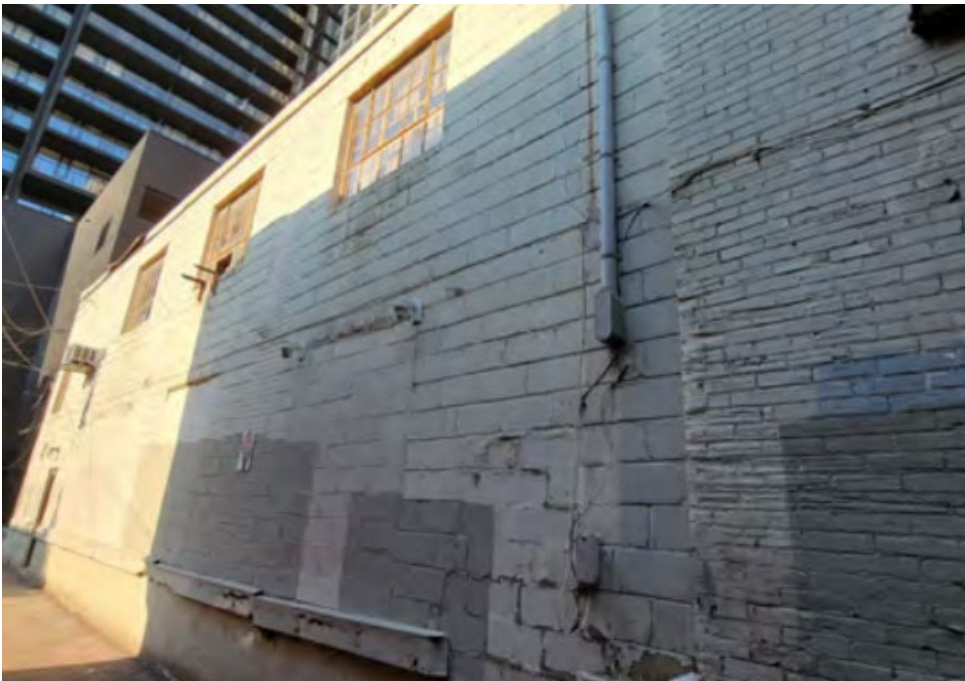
Current photo showing the partial east elevation with the early-to-mid 20th century two-storey rear additions constructed of concrete block (ERA, 2022)
